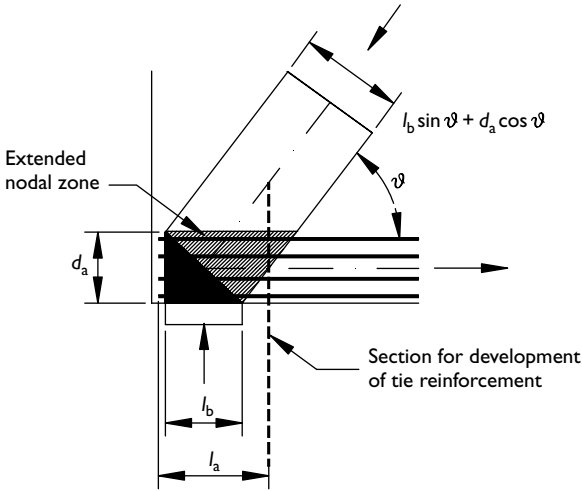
Extended nodal zone and anchorage length for reinforcement.
